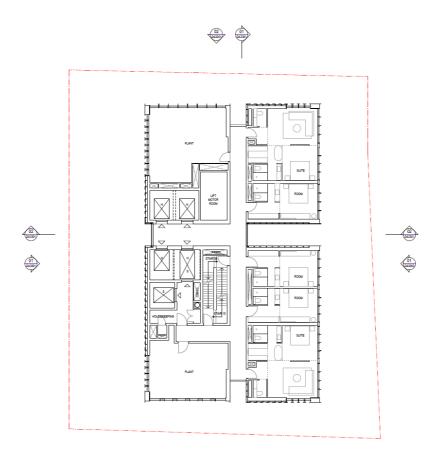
| Proposed level 54 (Source: Woods Bagot)
